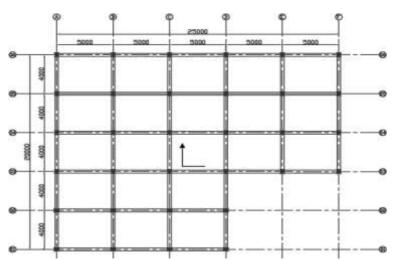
Plan of Two, Six, and Twenty-Story Irregular RC Buildings (All Dimensions Are In Mm)
